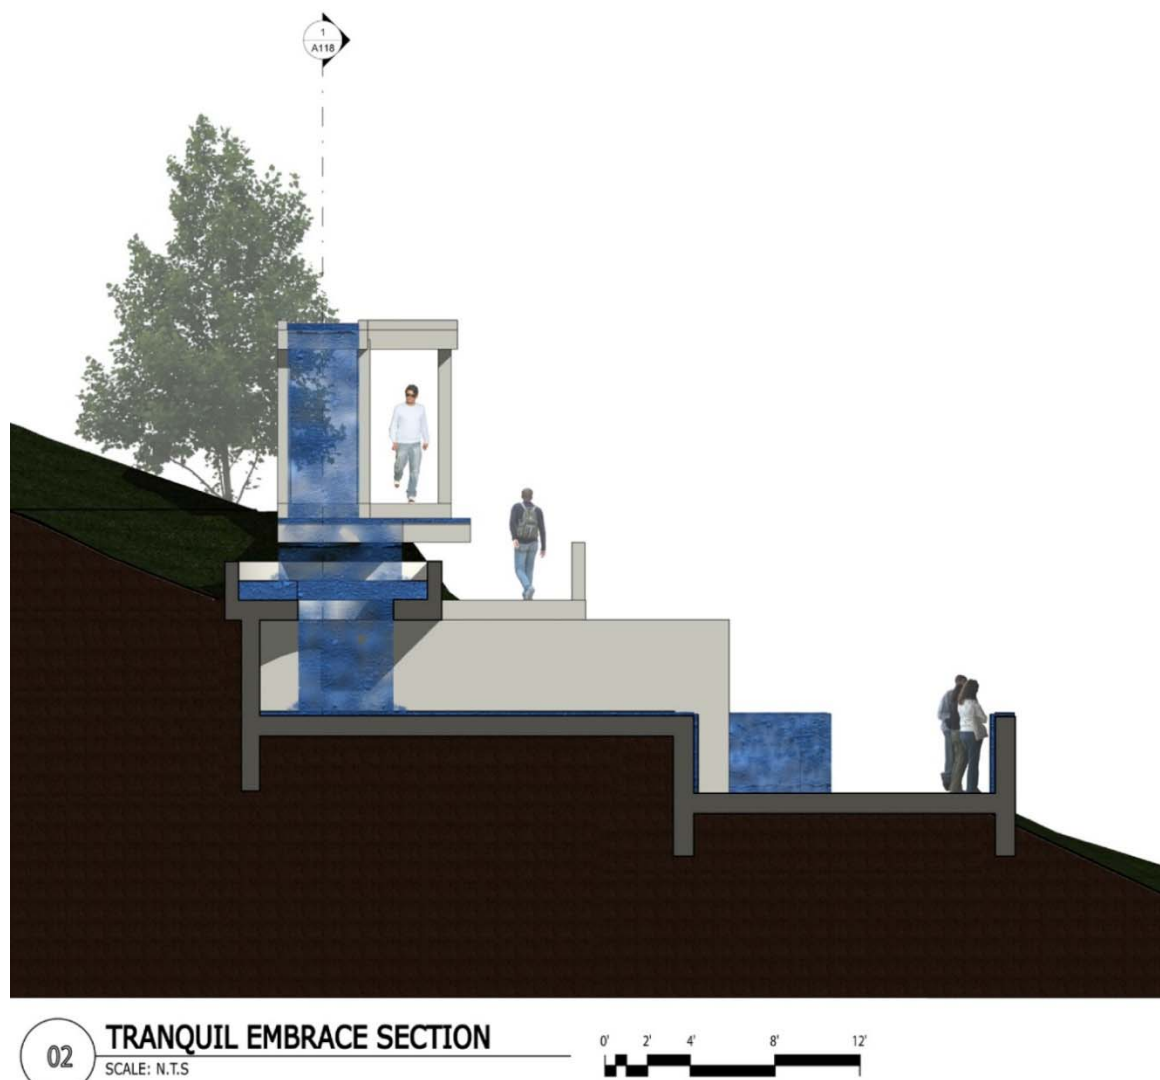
Tranquil Embrace Cross Section. Made by Author.
